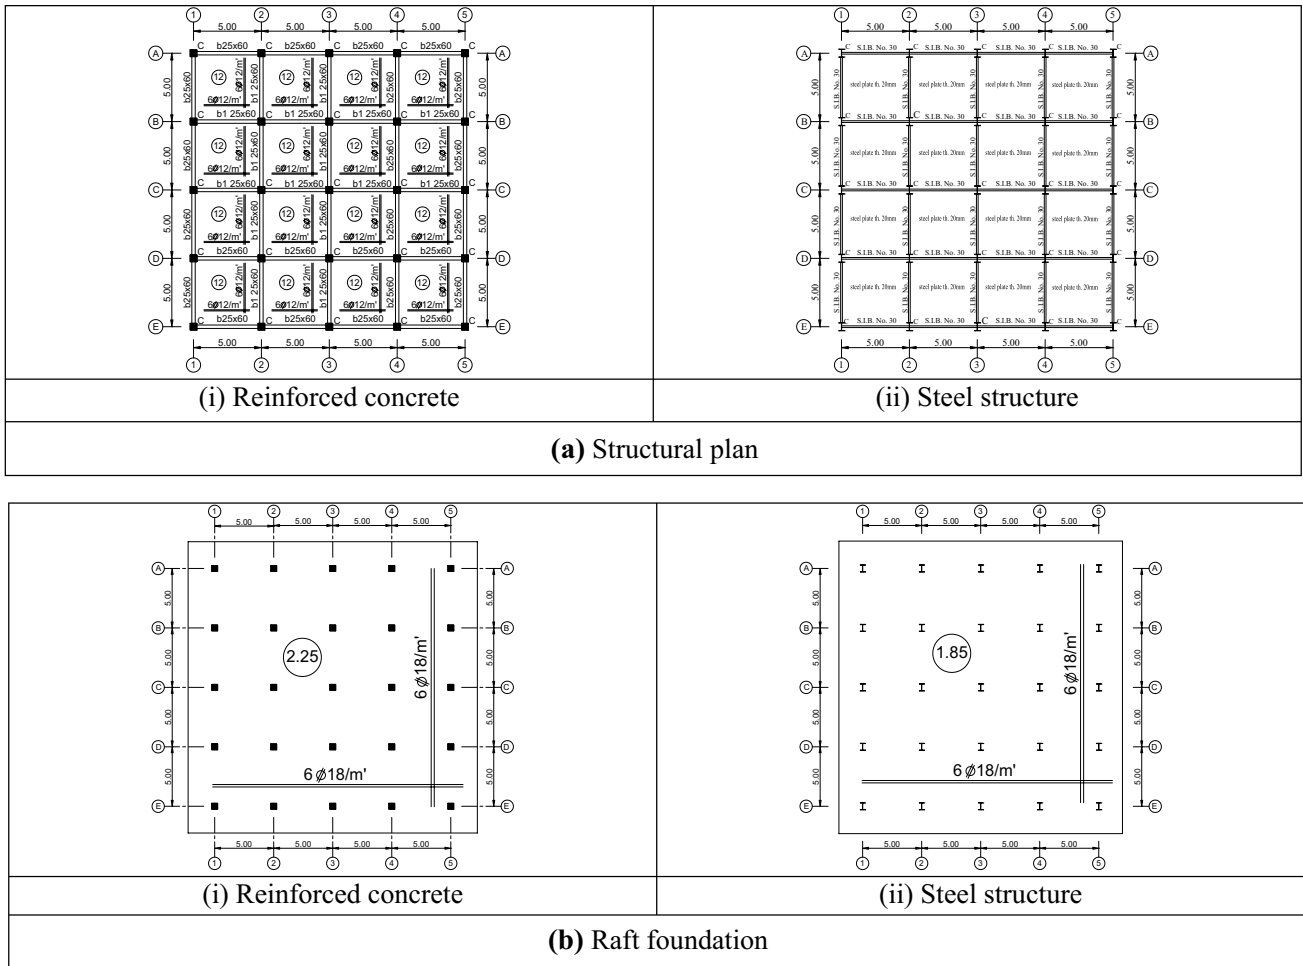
Structural plans and details of the RC HRB and the steel HRB
